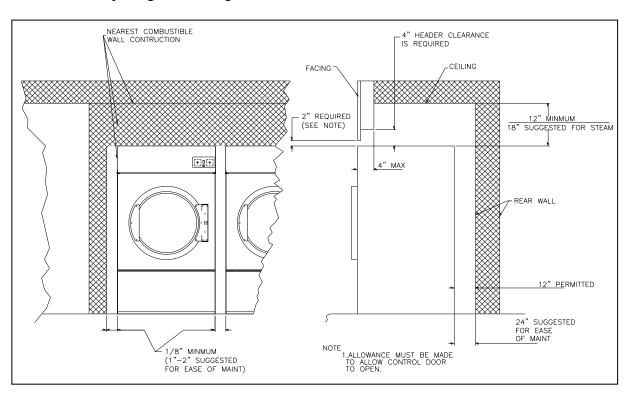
Dryer Clearance to Adjacent Wall Structures
